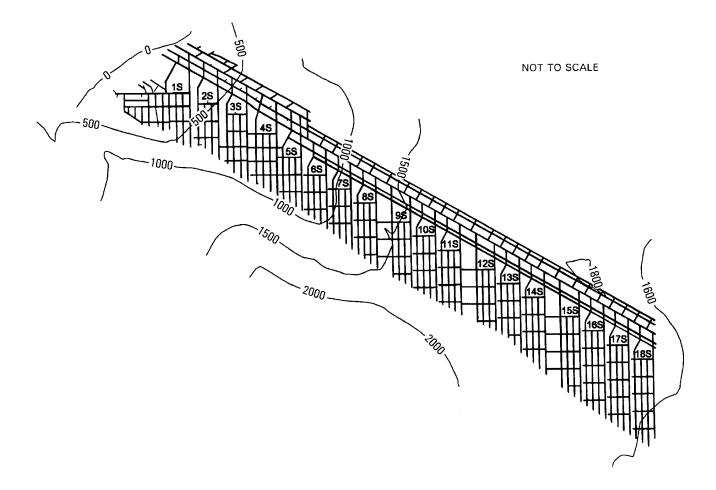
Layout of 5B-4 Mine. (Elevation in feet.)
